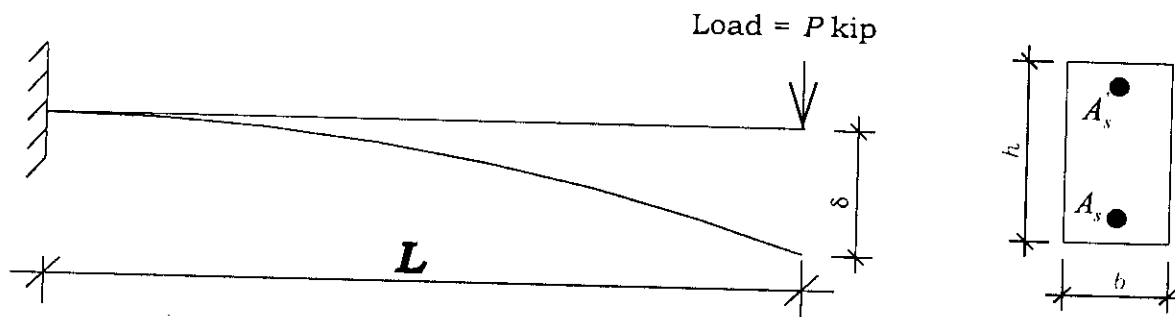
Deflection of a reinforced concrete cantilever beam.
